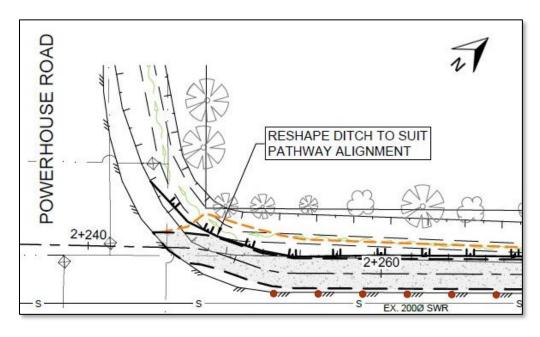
Proposed scope activities at Powerhouse Road including culvert installation and extension on the south side of the road, vegetation removal, and re-shaping the ditchline on the west side of Lake Trail Road.
